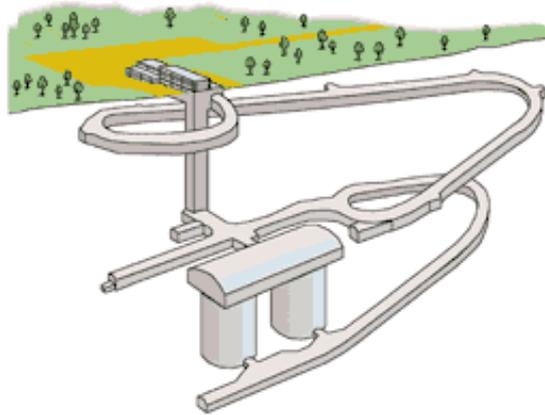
Layout of the low- and medium activity waste repository (www.hightechfinland.fi 2009).
